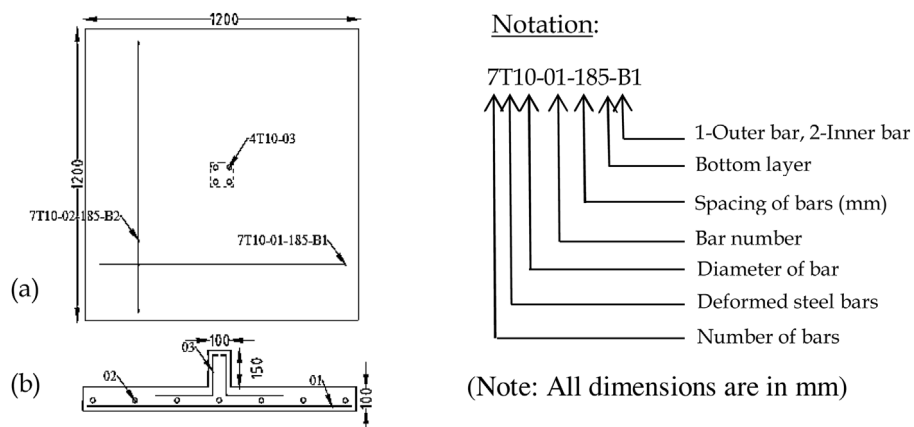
Reinforcement Details, (a) Plan, (b) Sectional elevation.
